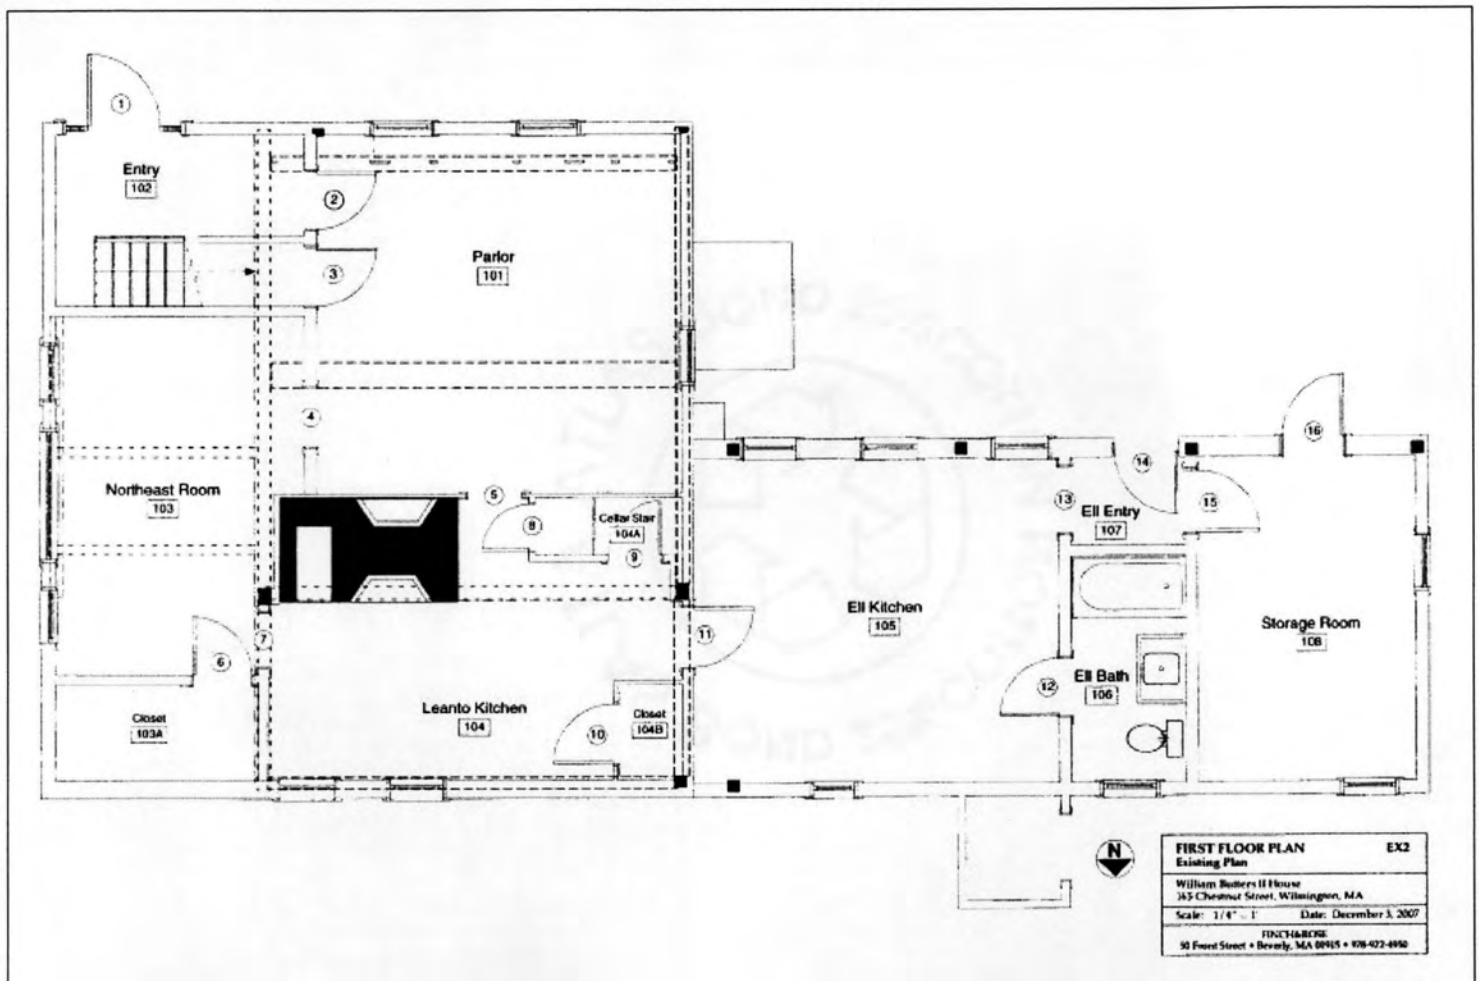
First Floor Plan, existing conditions. Drawing by Finch & Rose, 2007.
